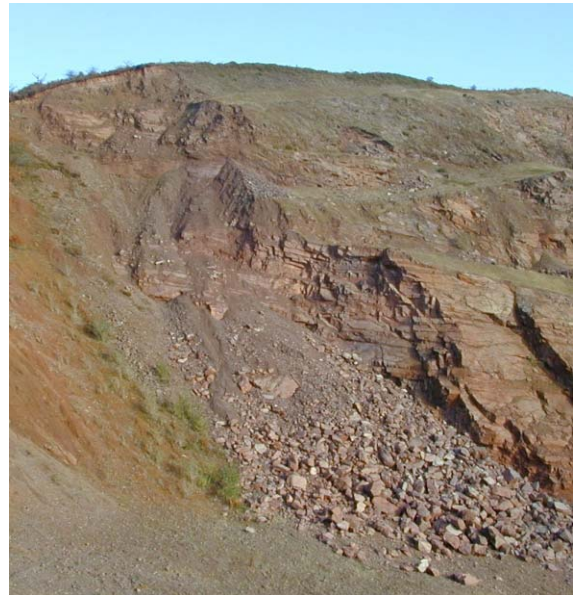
Planar instability along bedding and loss of quarry crest and access to lower benches
